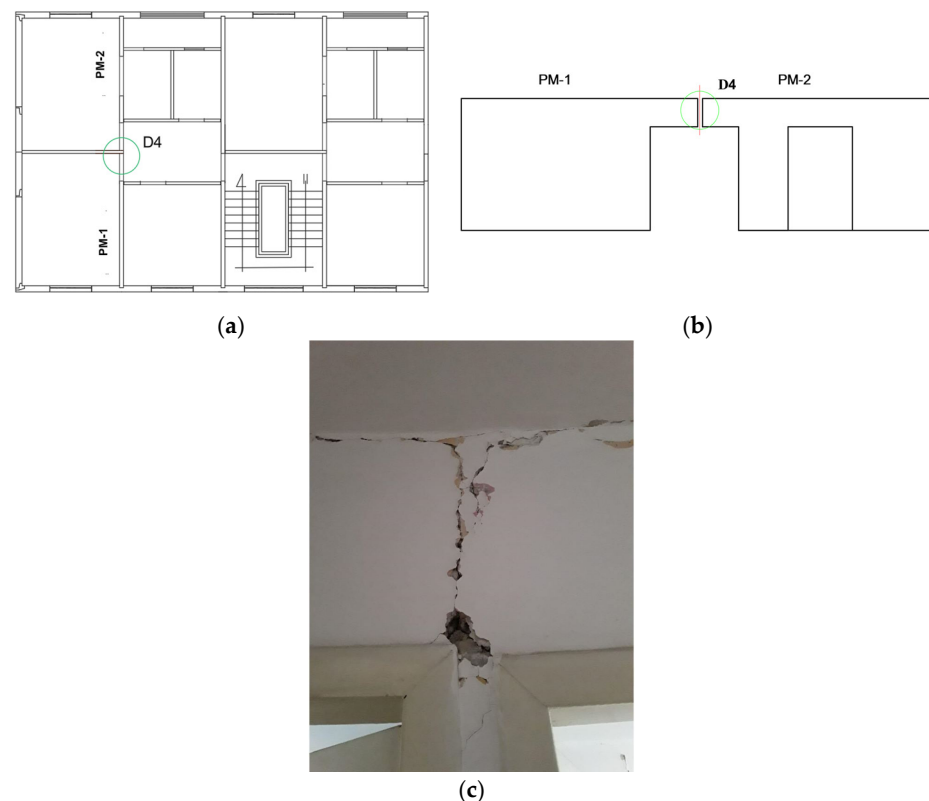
A damaged LPB building in Tirana due to the 26 November 2019 earthquake (Mw 6.4): (a) floor plan showing the location of damaged vertical joint D4; (b) vertical elevation of the wall assembly, showing the joint location; (c) observed earthquake damage.
